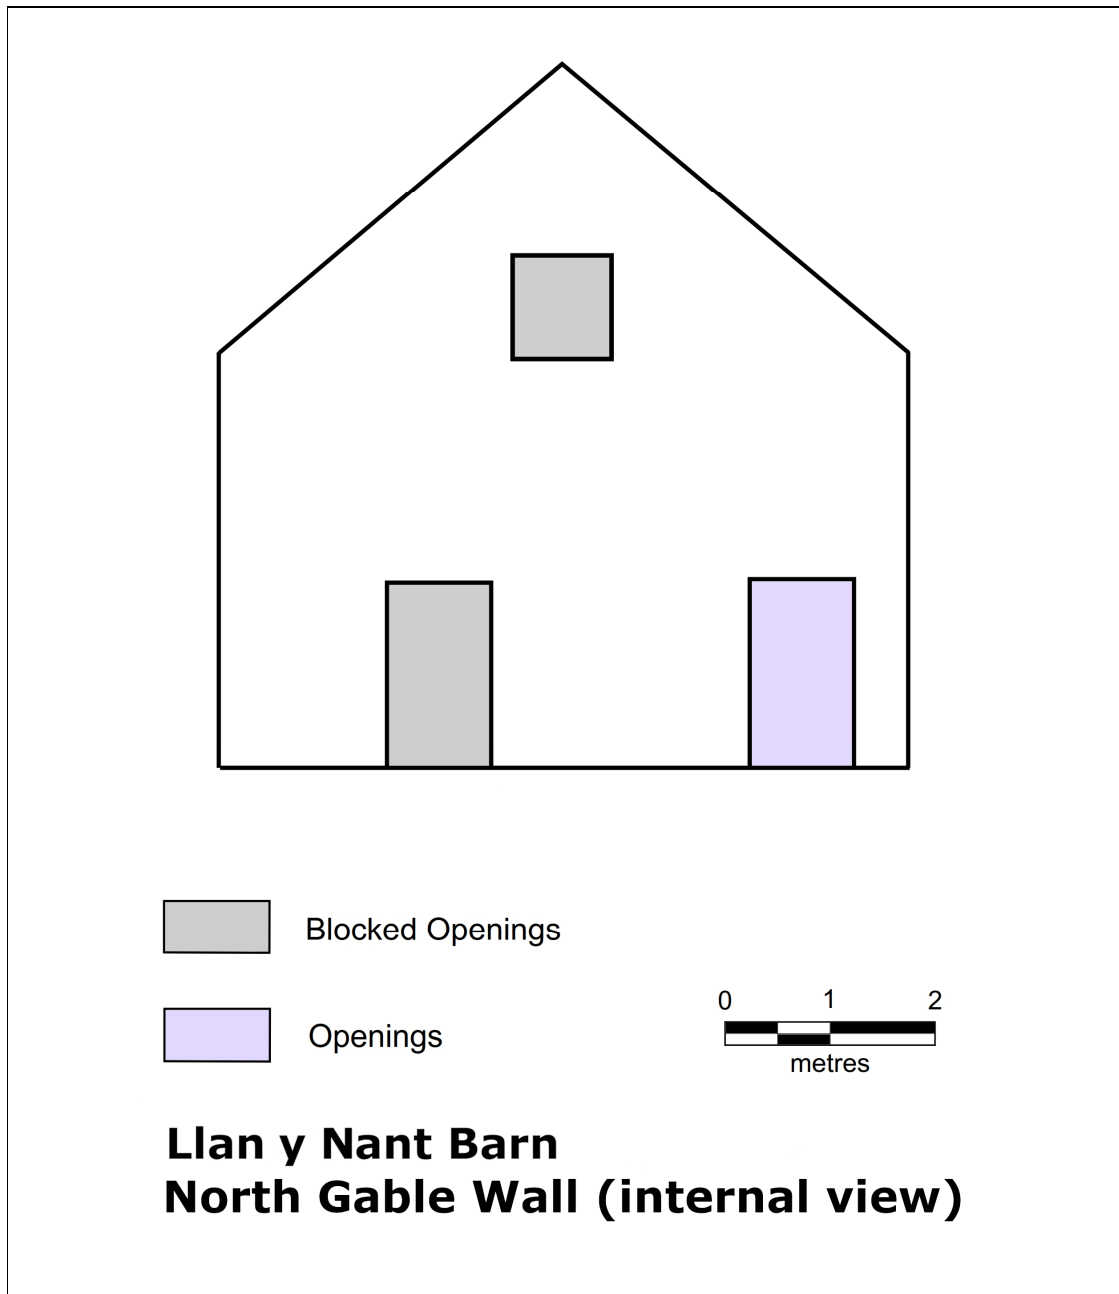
Elevation drawing of the northern gable wall of the barn, looking north
